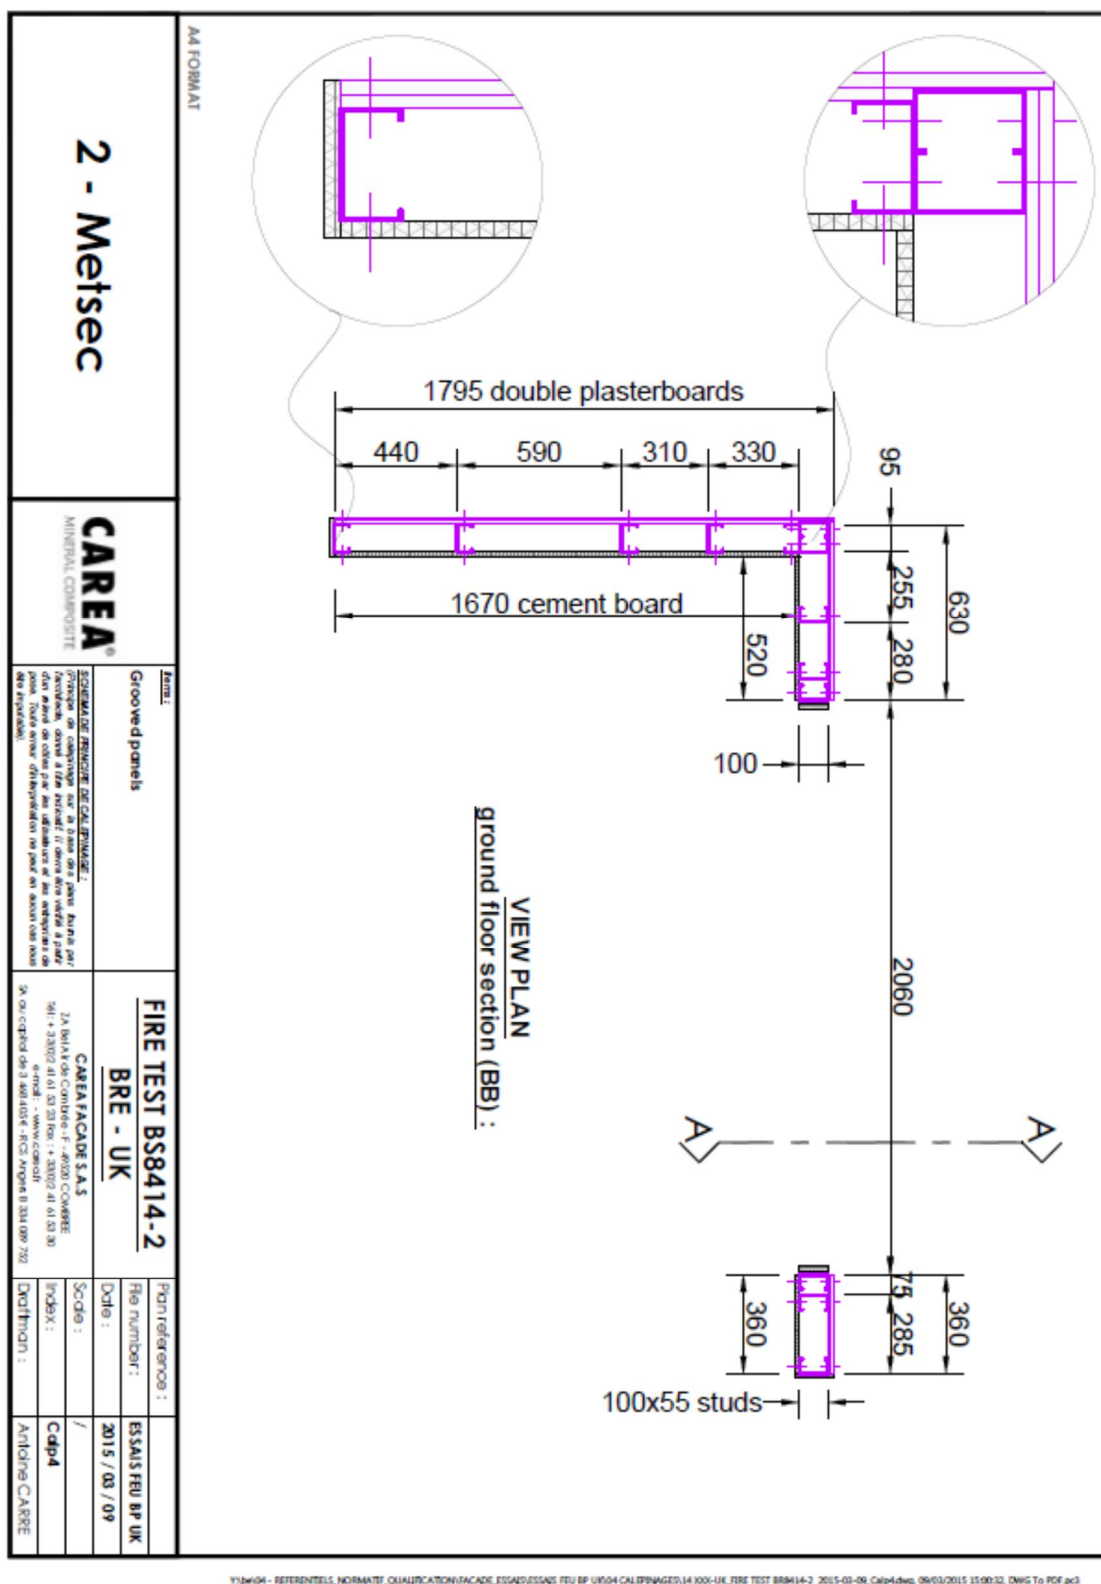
Ground floor section of double plasterboard layers and cement sheathing board
